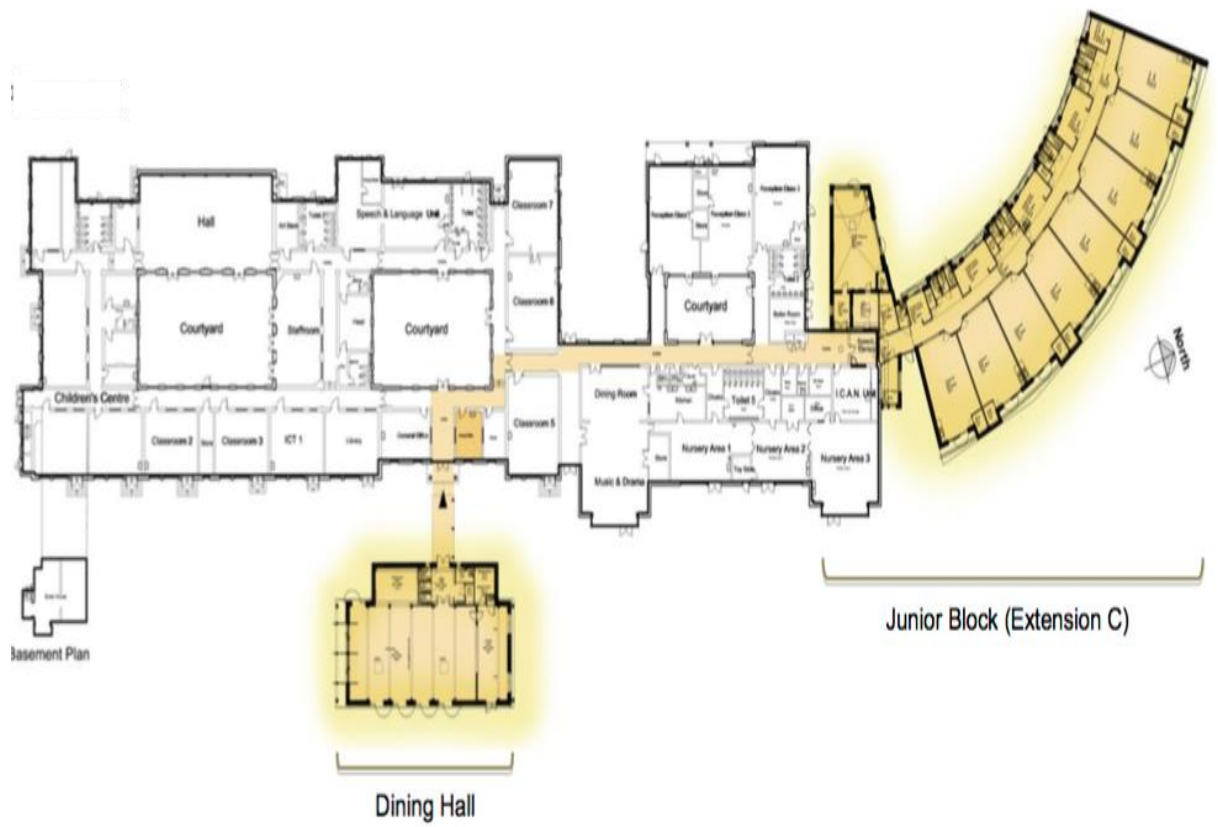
1: Floor Plan Showing Dining Hall and Class Extension
